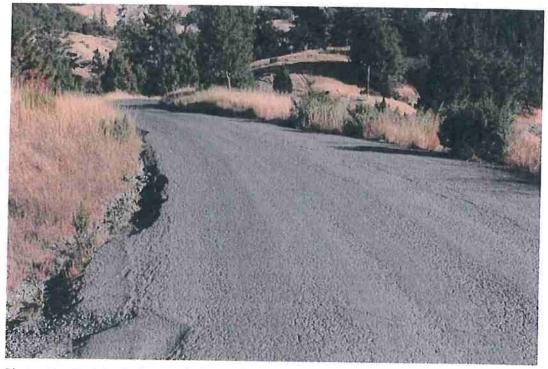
Mile 3.8: 18-ft road width with 1-ft shoulders.
